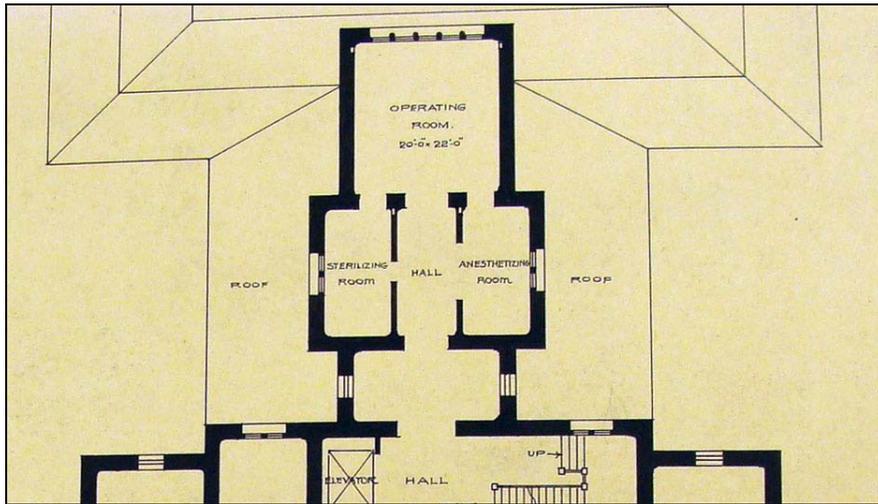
Detail of Operating Room in "Proposed Battle Mountain Sanitarium Second Floor Plan"
